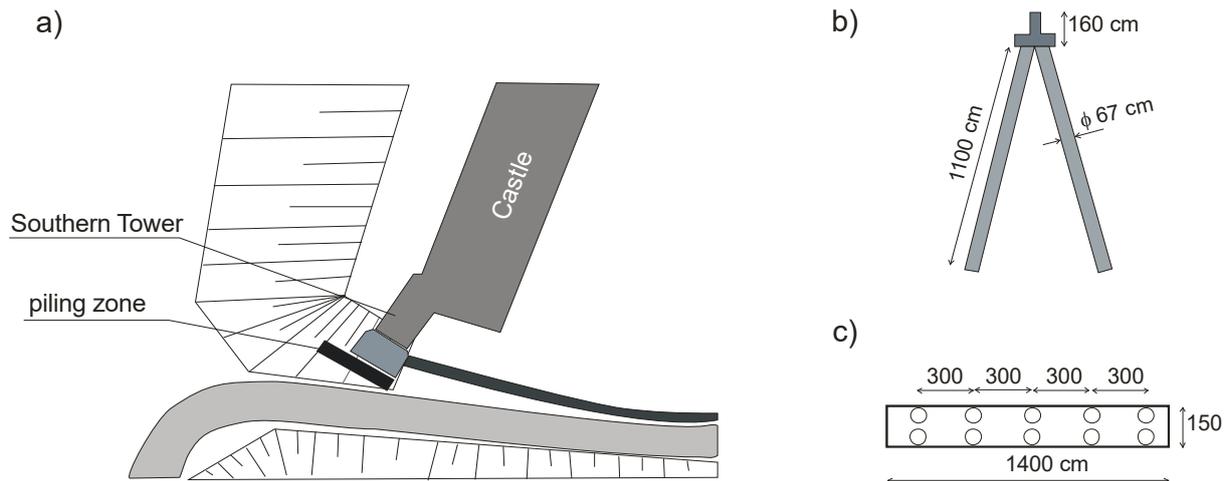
Piling at Castle Hill: a) localization of the piling zone, b) concrete raked piles, c) piling system
